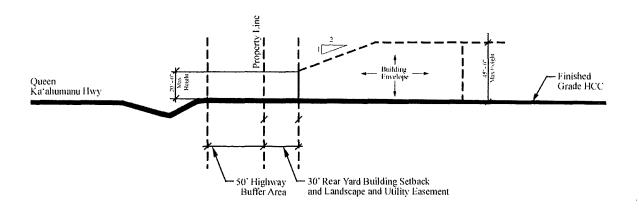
Building Envelope Along Queen Ka'ahumanu Highway
